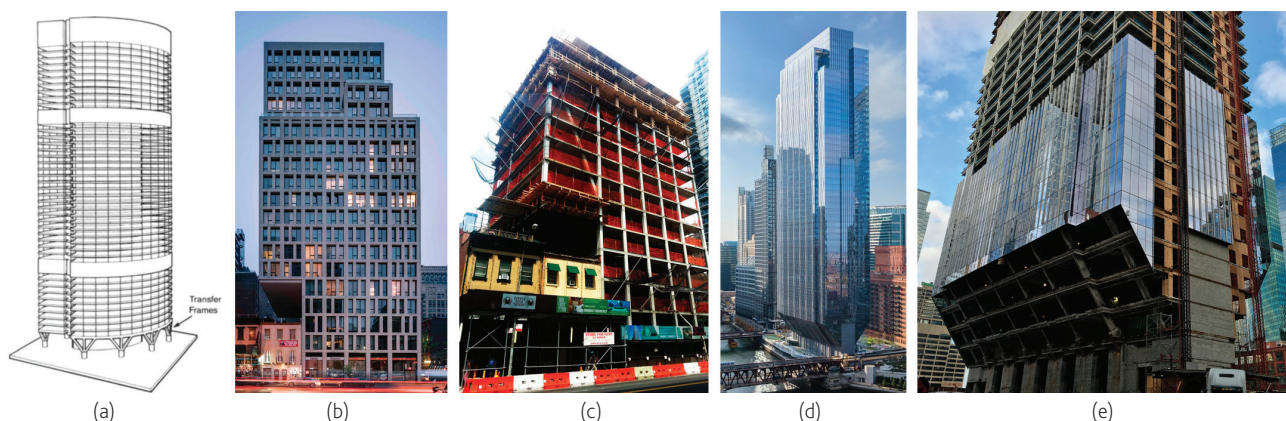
(a) Structural system of the Grosvenor Place, Sydney, Australia; (b) 160 East 22nd Street Building, Manhattan, New York, USA; (c) Inclined column view during construction of the 160 East 22nd Street Building; (d) 150 North Riverside Plaza, Chicago, USA; (e) Inclined columns of the 150 North Riverside Plaza
